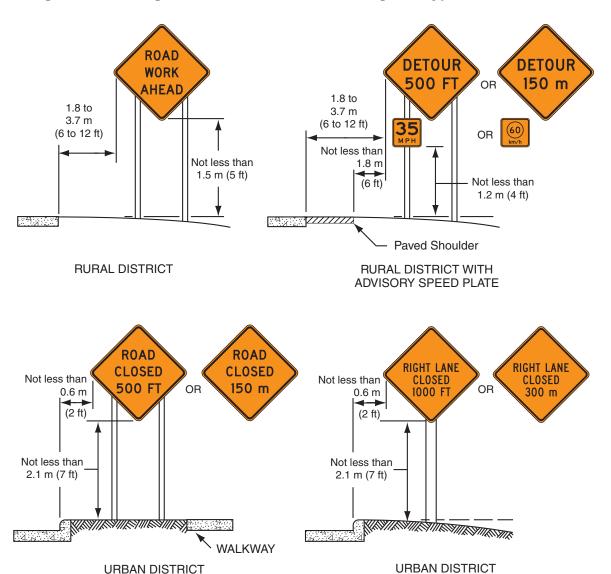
F-1. Height and Lateral Location of Signs—Typical Installations
